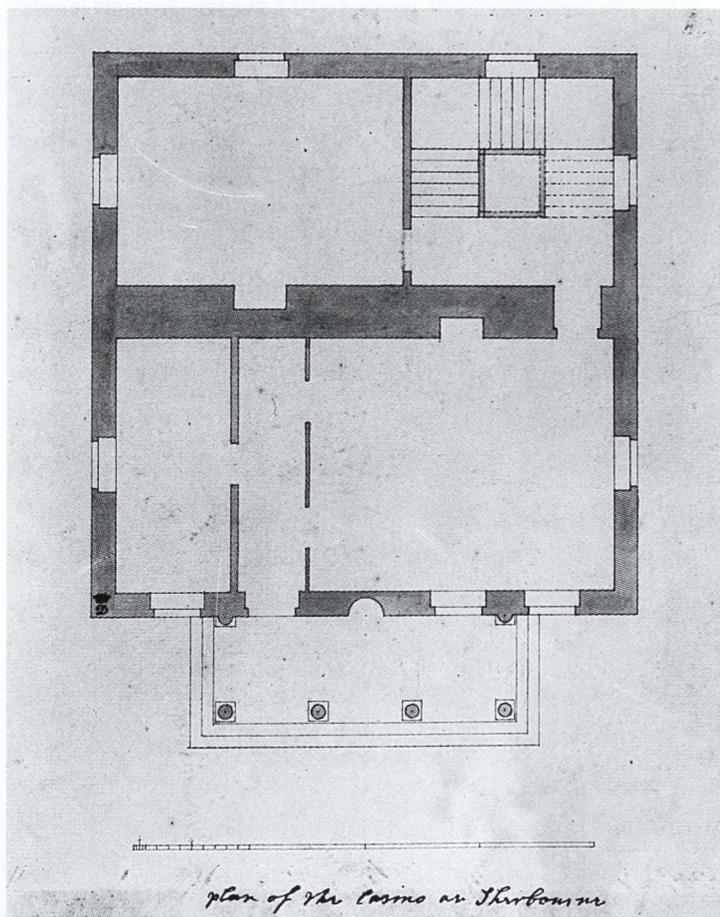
Henry Flitcroft, drawing of ground floor plan, Lodge Park, Sherborne, Gloucestershire. RIBA Drawings Collection.
